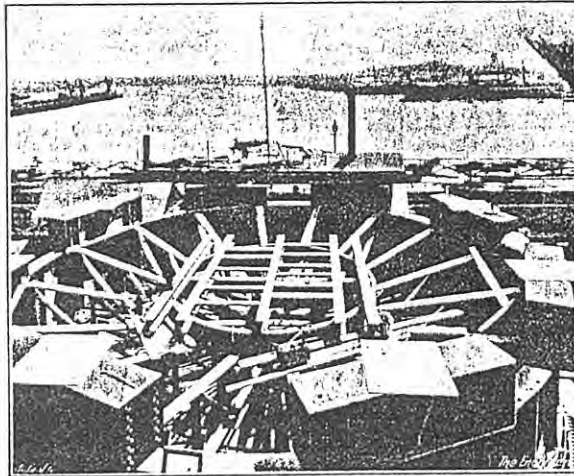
DRUM AND DISTRIBUTING GIRDERS
